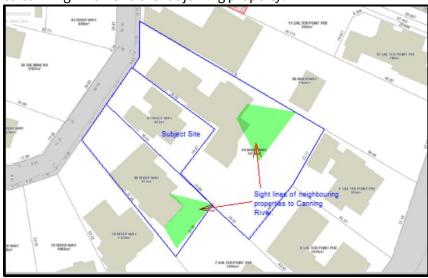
Sight Lines currently enjoyed by adjoining properties.
